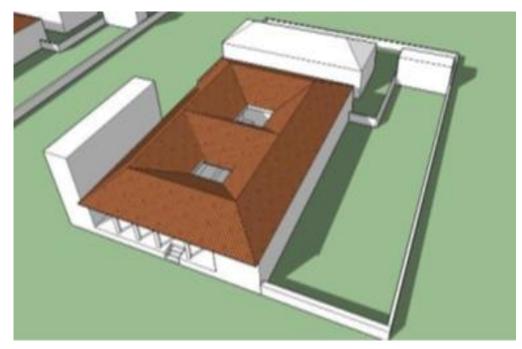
First Transformation of Original Form of Building (FT-OFB); 1948-69. (Source: Chadalavada et al., 2017)
